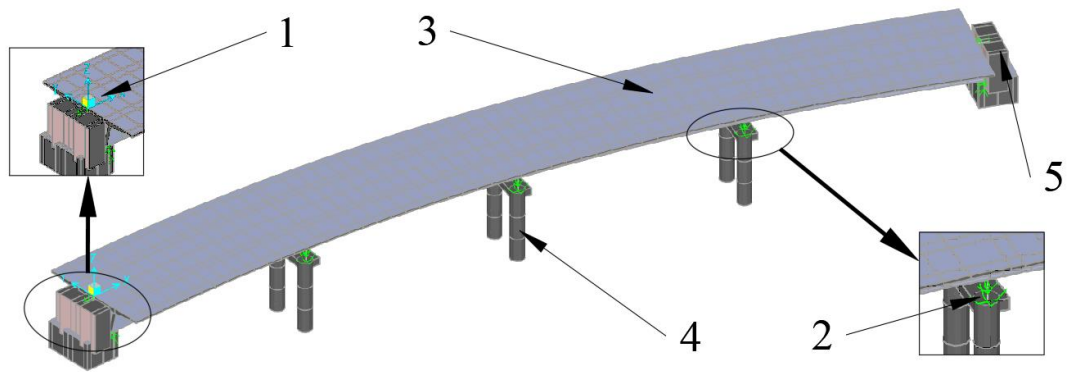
3D view of curved bridge (1) abutment; (2) FPS; (3) main girder; (4) abutment; (5) expansion joint.
